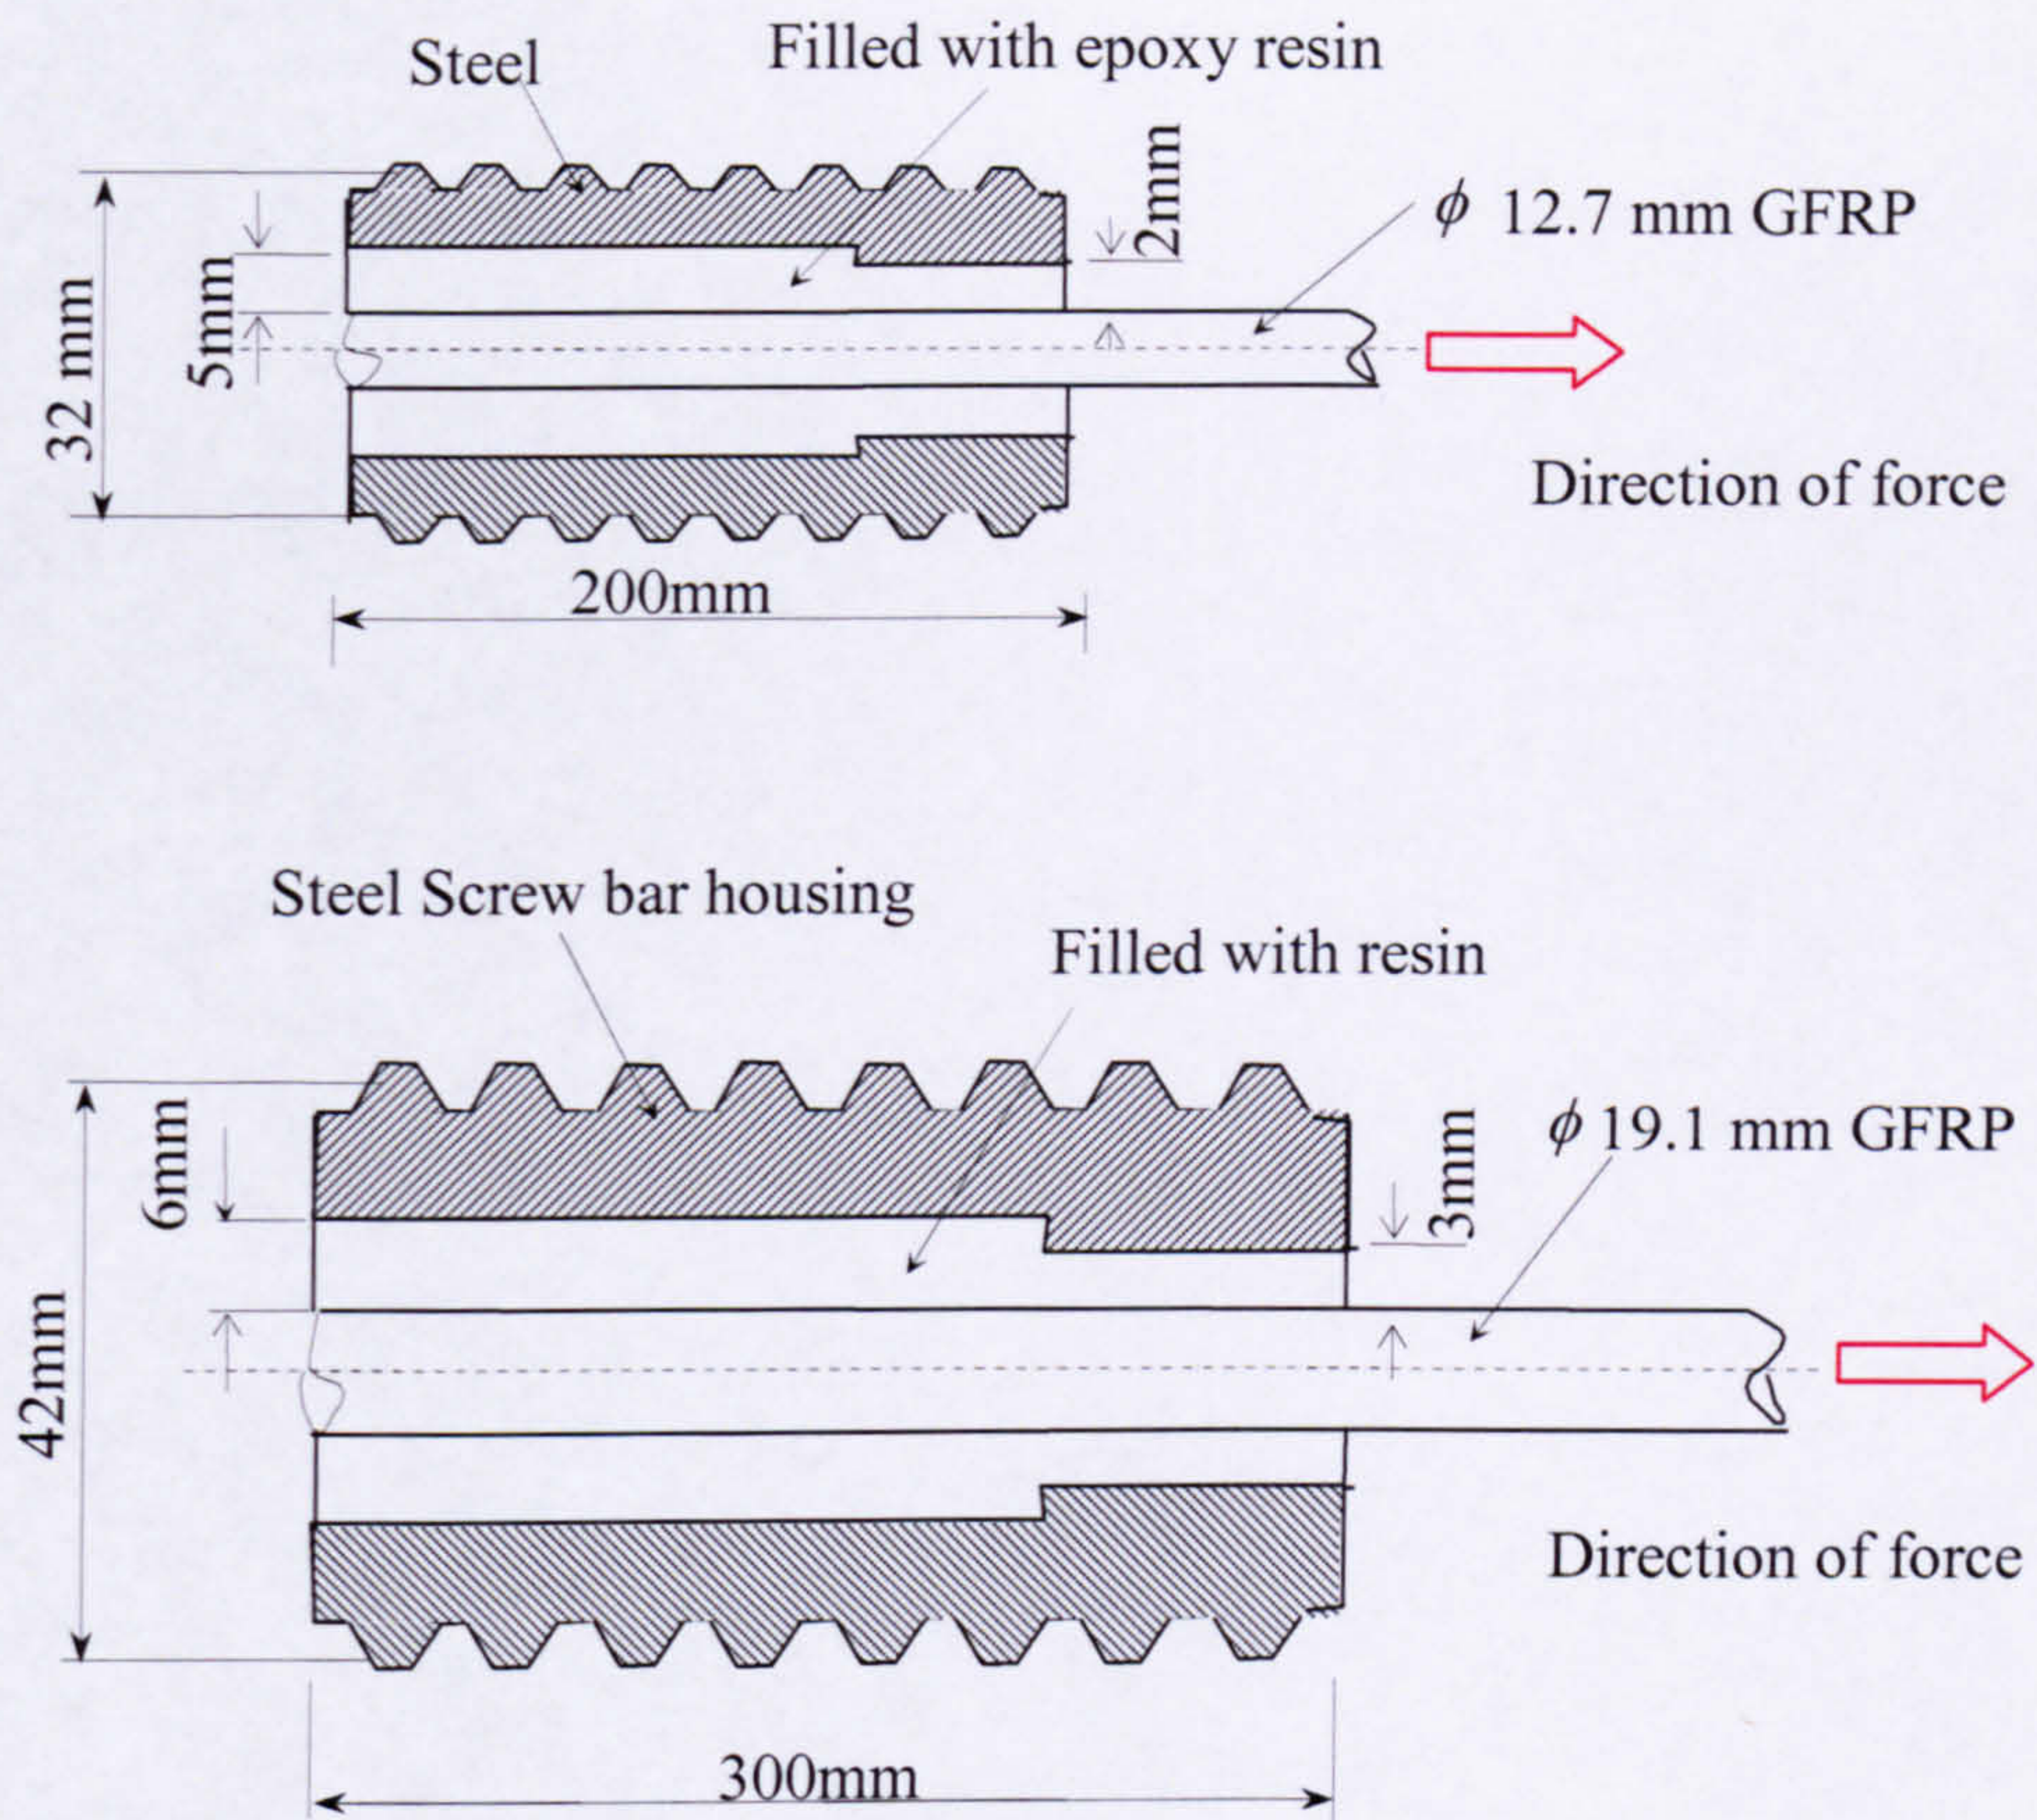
Details of the gripping system for the GFRP bar used for both tension test and tension stiffening studies
